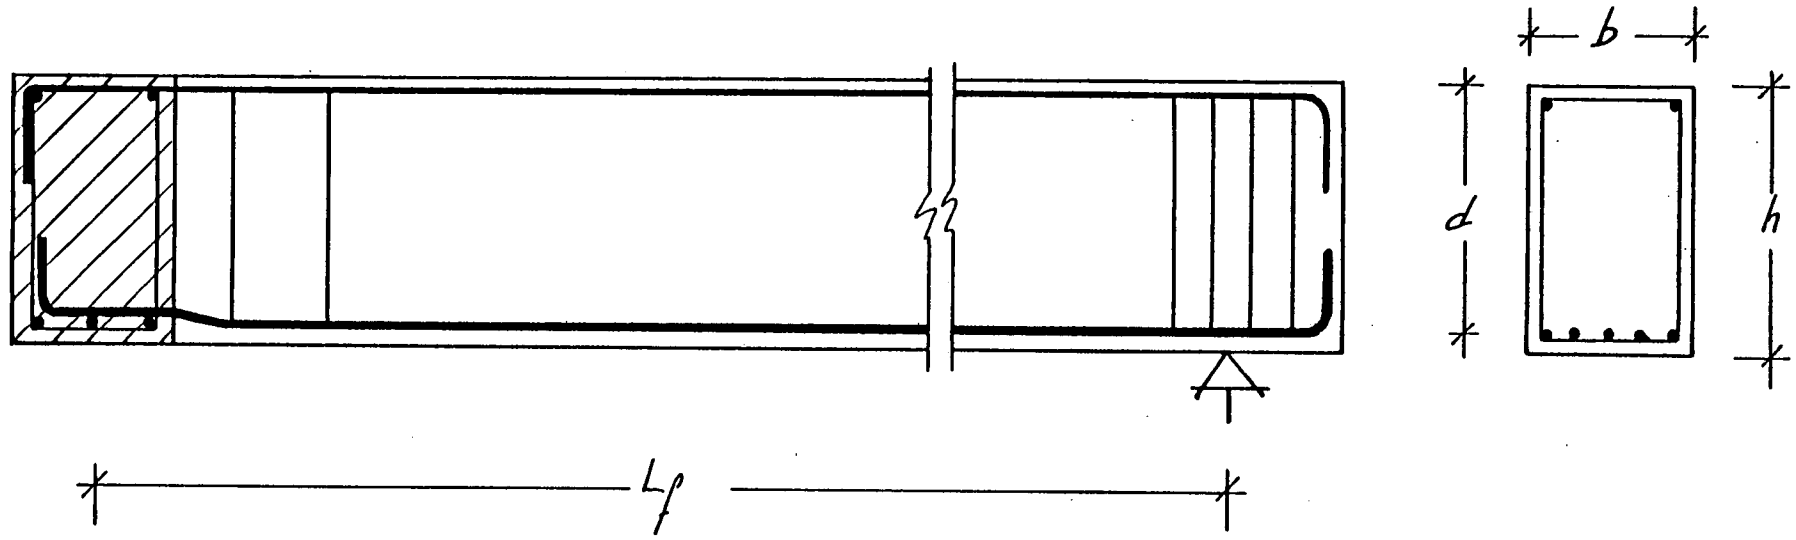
Typical Reinforcing Details (Spandrel Beam Shaded)
